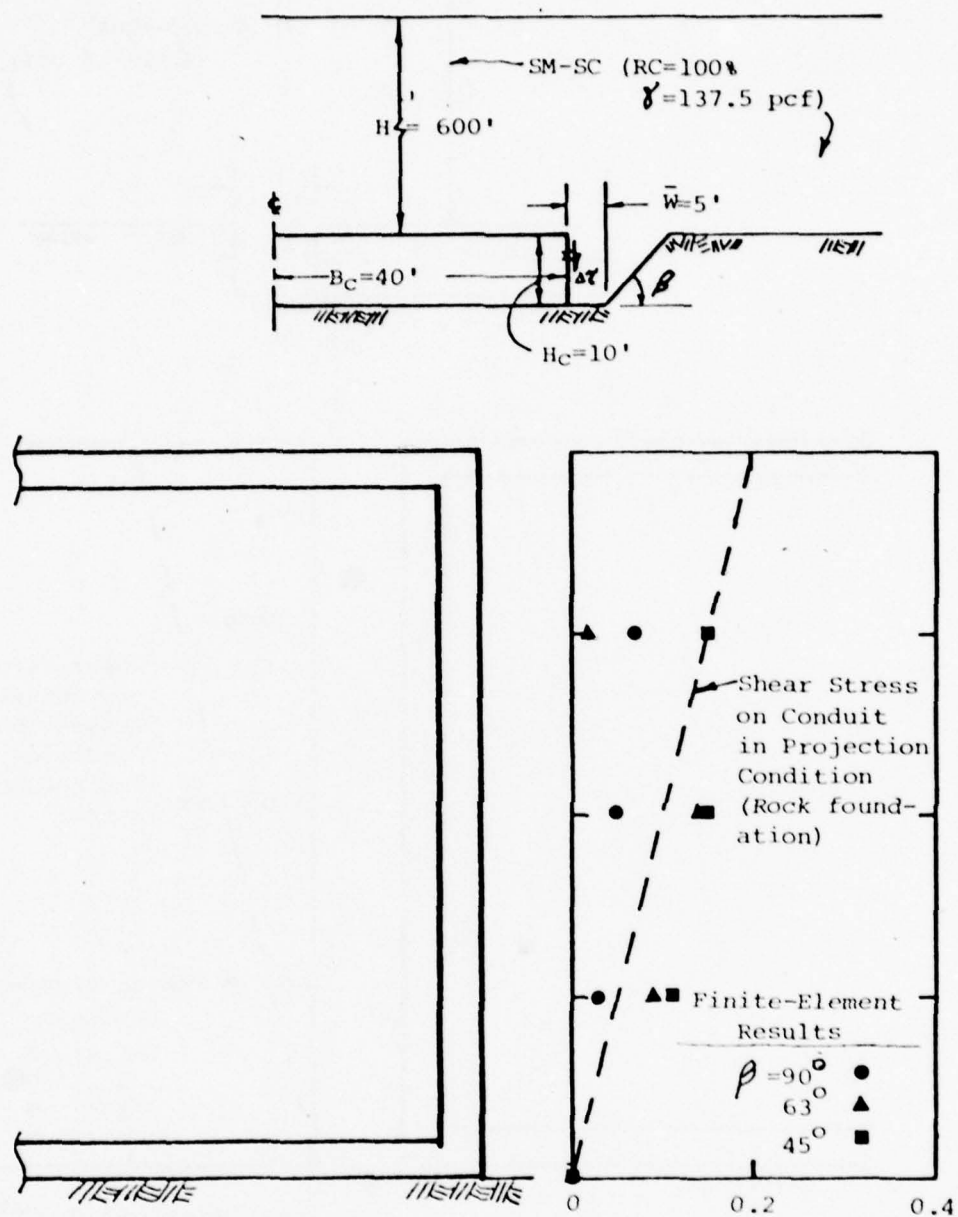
SIDE-SHEAR STRESS ON RECTANGULAR CONDUIT IN SHALLOW TRENCH WITH SLOPING WALL
